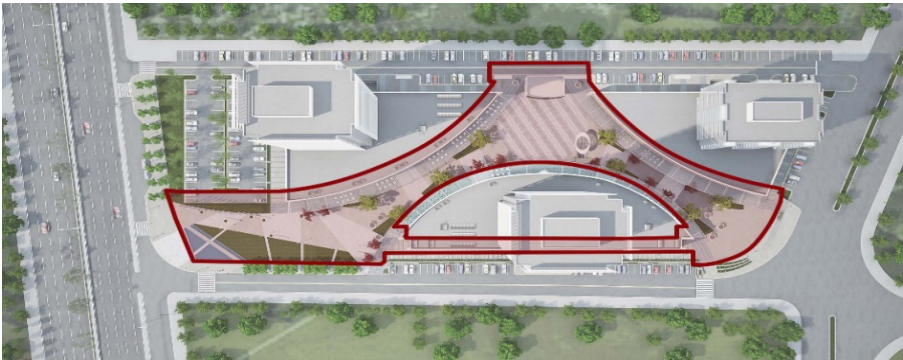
Tepe Prime Avenue project site plan and semipublic spaces
